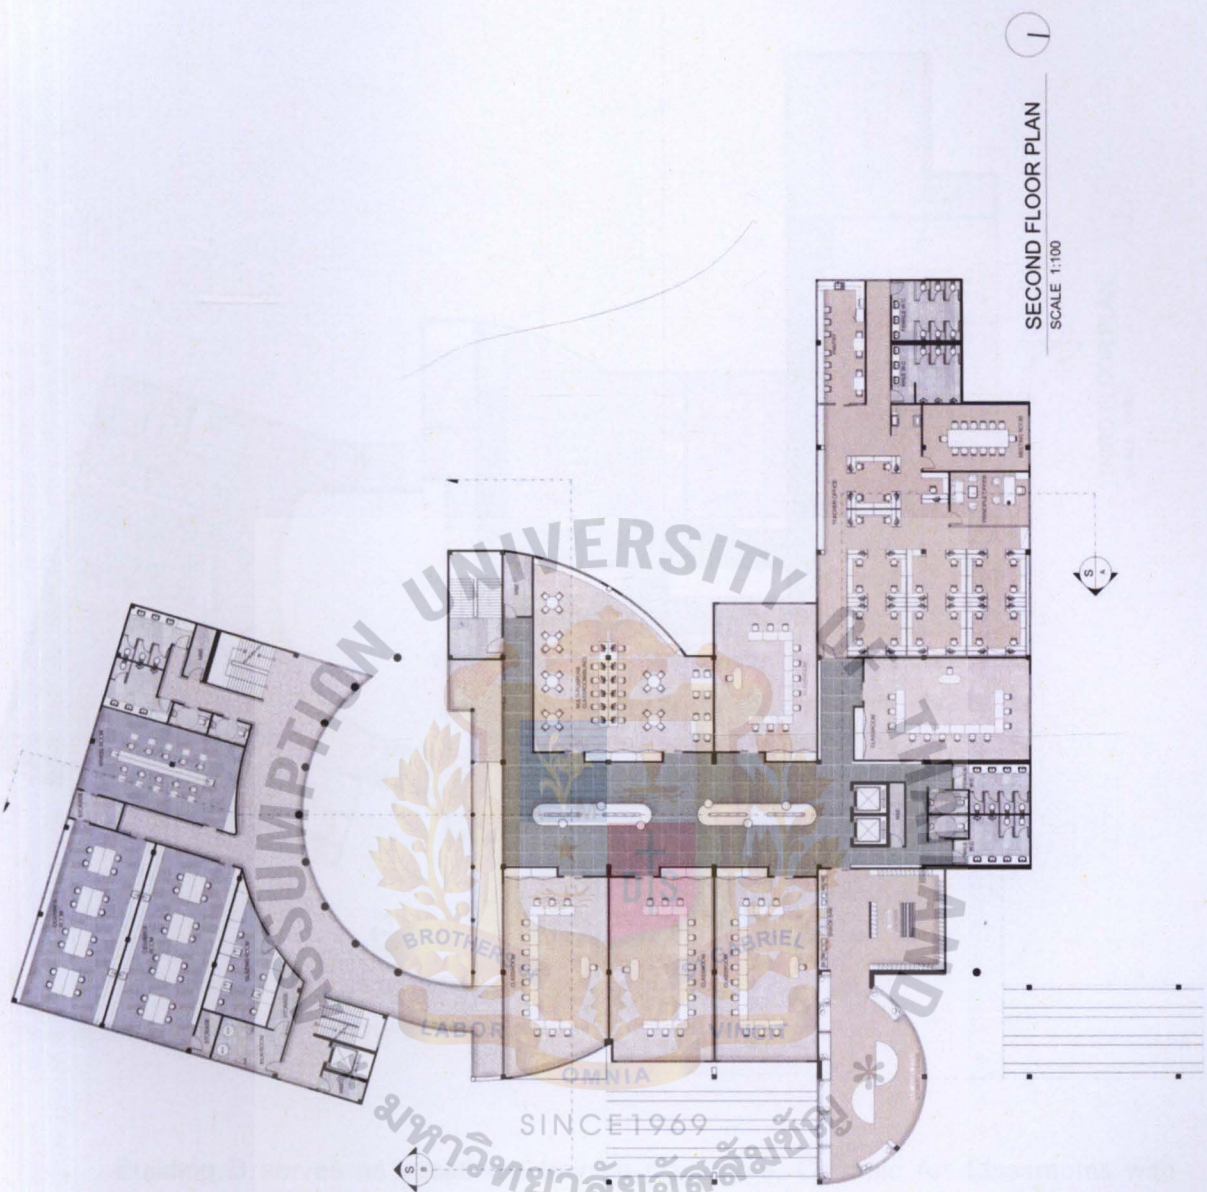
SECOND FLOOR FURNITURE LAYOUT PLAN
